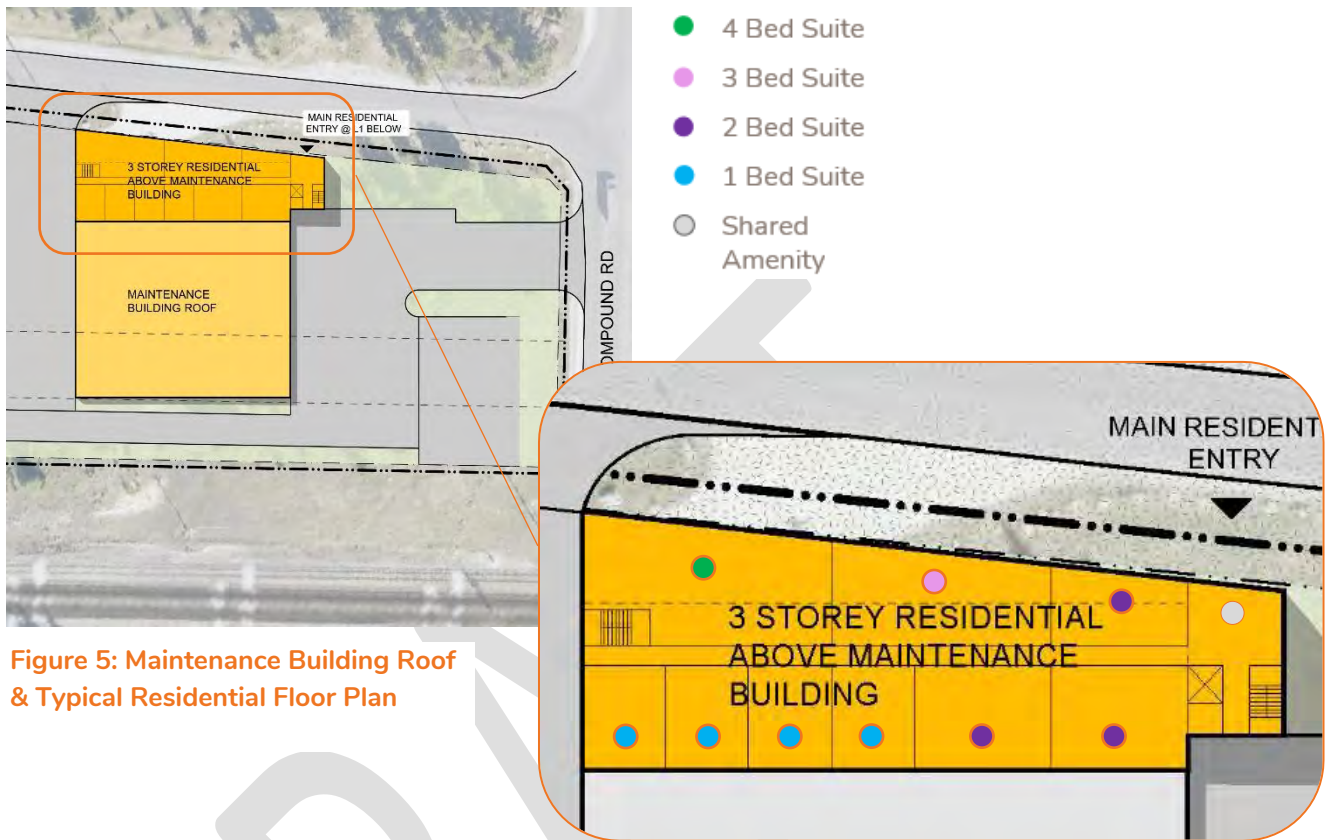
Maintenance Building Roof & Typical Residential Floor Plan
